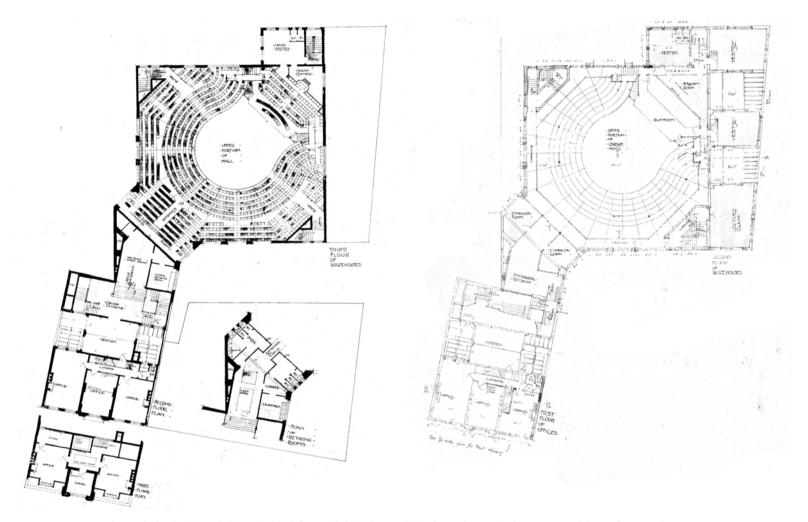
Gallery (left) and third floor (right) plans of the Queen's Hall. Source: Bradshaw Gass and Hope.
